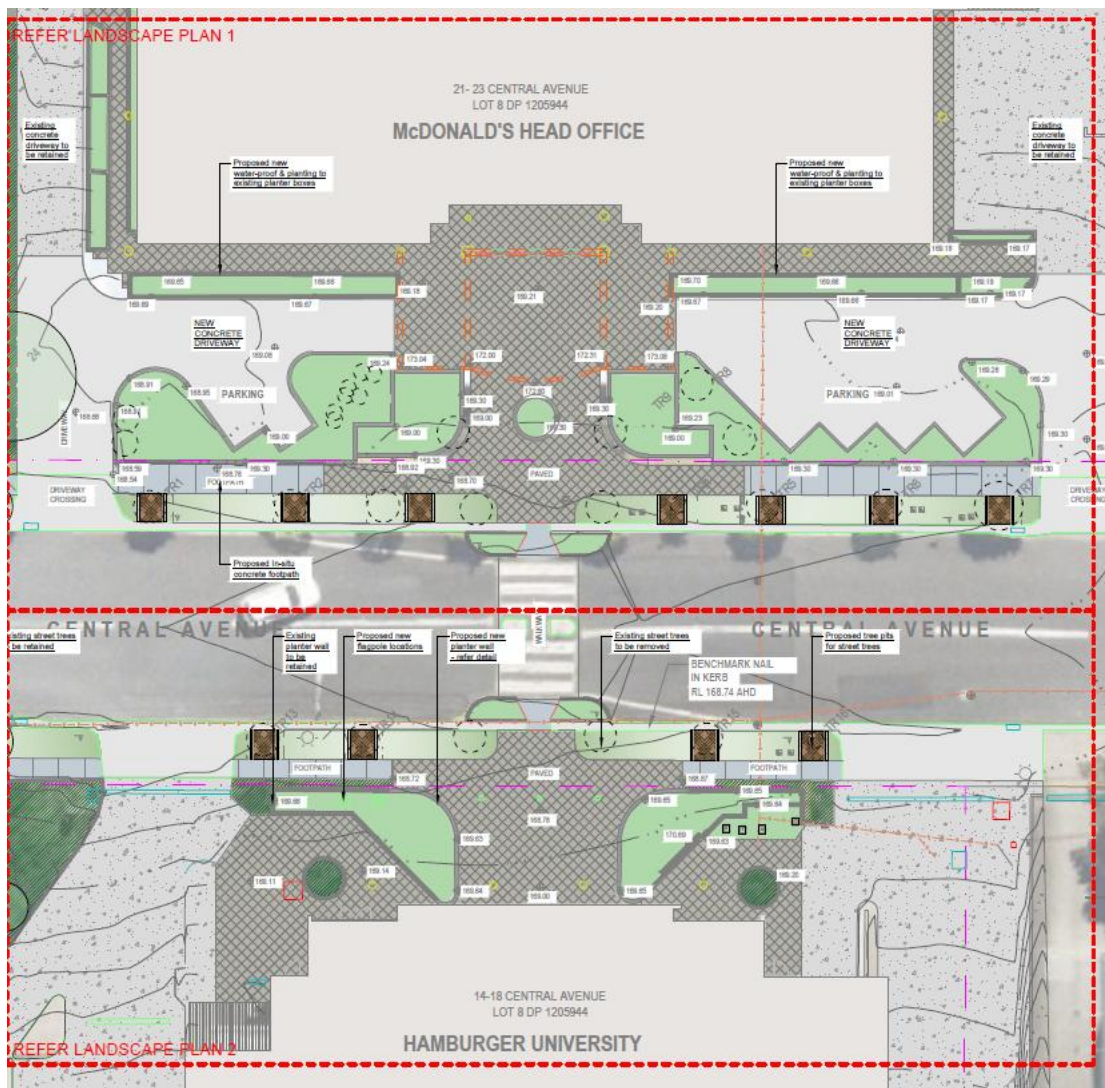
Extract of Landscape Plans (Source: Concept Landscape Architects)
